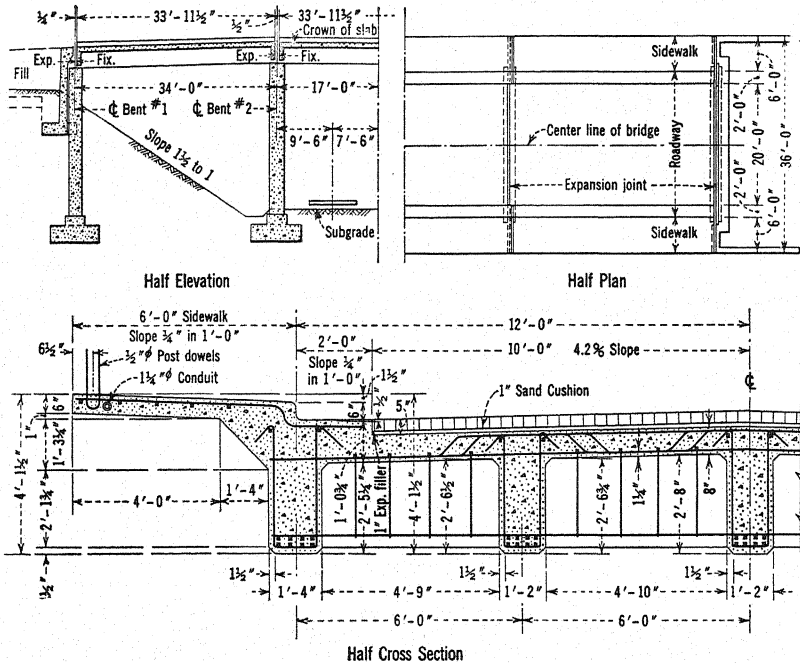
Pells Street Crossing, Illinois Central Railroad, Paxton, Illinois.
